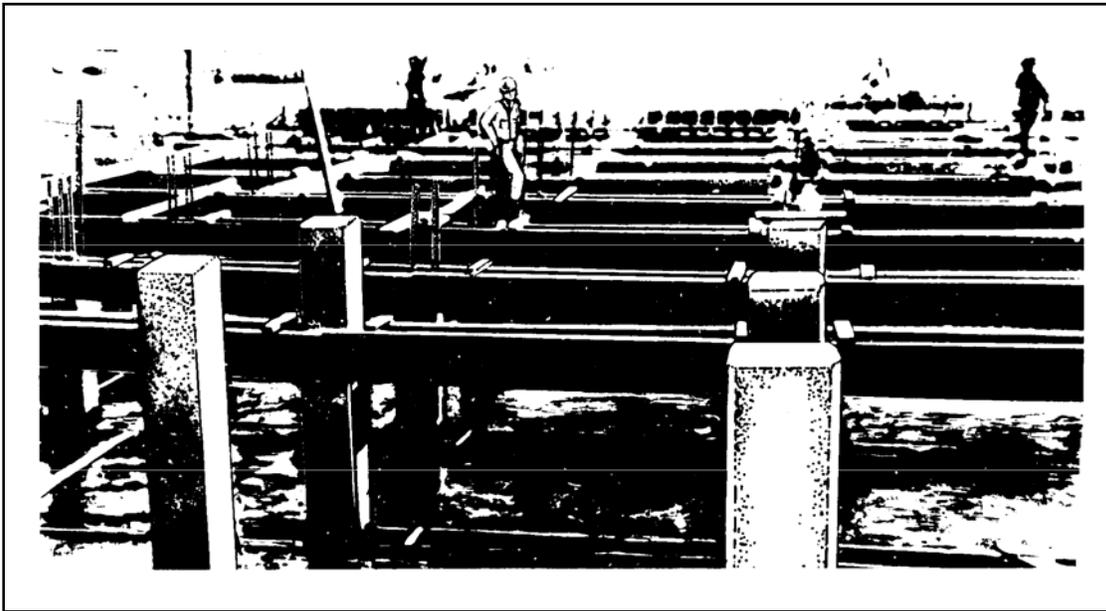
Piles cut to elevation exposing steel reinforcing bars
